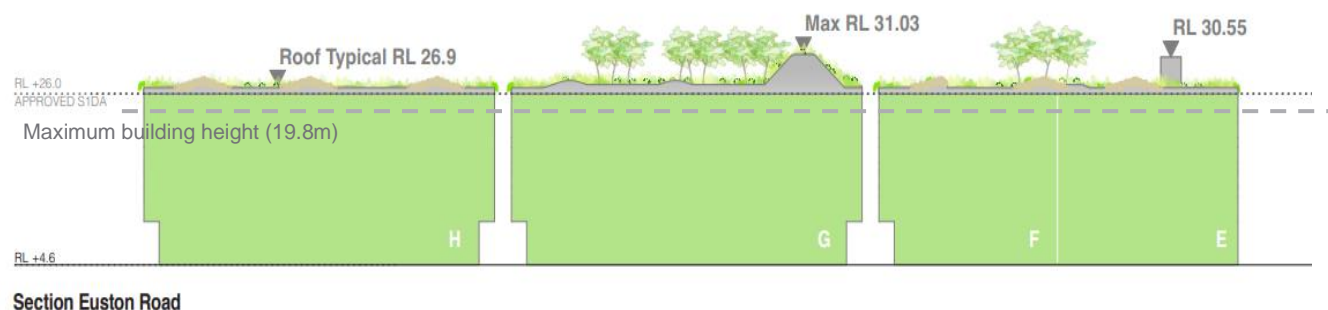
Typical nature of building height exceedance for Parkside Buildings
